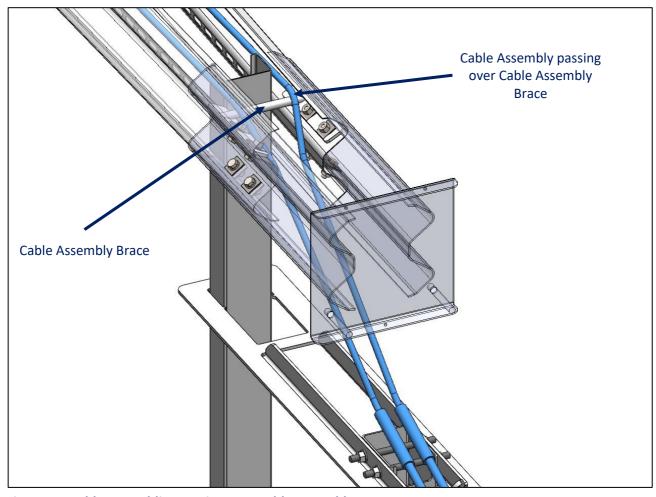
Cable Assemblies Passing over Cable Assembly Brace
